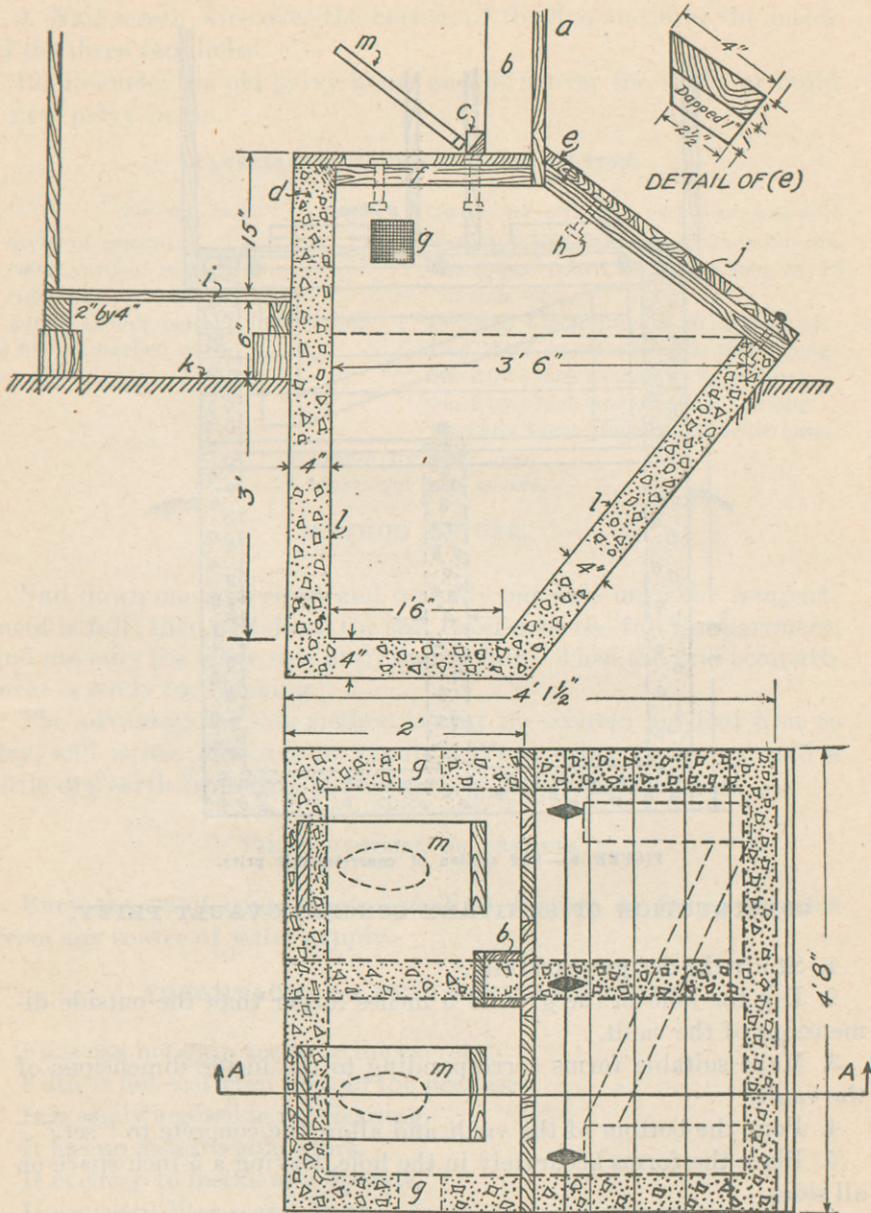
Plan and elevation of concrete vault privy. (a) Back wall of Louse; (b) vent, 4 inches square, inside house, screened at bottom; (c) No. 24 gage galvanized iron hinge; (d) concrete section in front of hole-cut to 2 inches; (e) 2 by 4-inch timber extends 1 inch over walls; (f) 2 by 4-inch timber; (g) vent, 4 inches in diameter; (h) 3/4-inch anchor bolts, 8 inches long; (i) house floor; (j) door to vault, should be waterproof; (k) ground line; (l) inside surface of vault, finished watertight with neat cement; (m, m) seats, 12 by 18 inches. Dimensions are approximate and may be varied.
